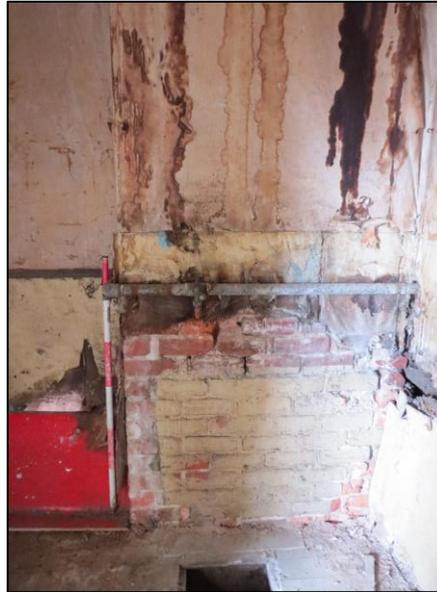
Room 47, close up of bricked chimney/fireplace, facing east
